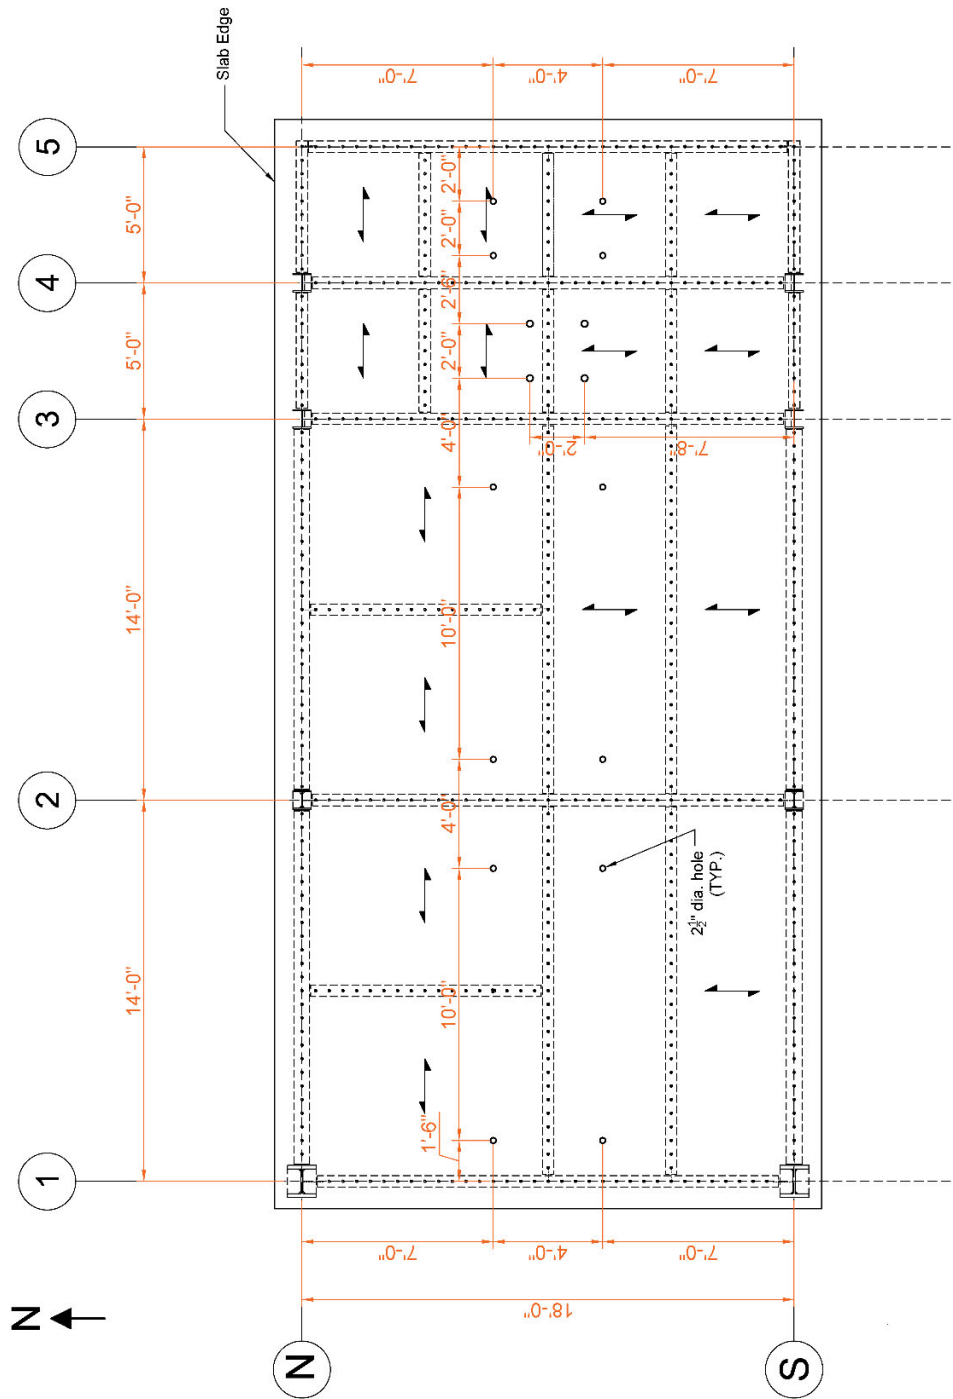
Core Drilling Holes on Concrete Slab (DWG S02)
